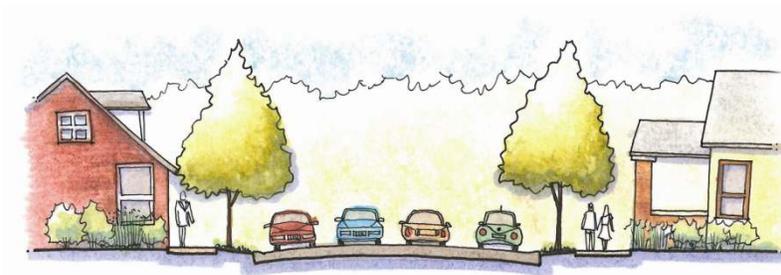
I: Typical cross-section of an urban development subcollector street with parking on both sides of the street
